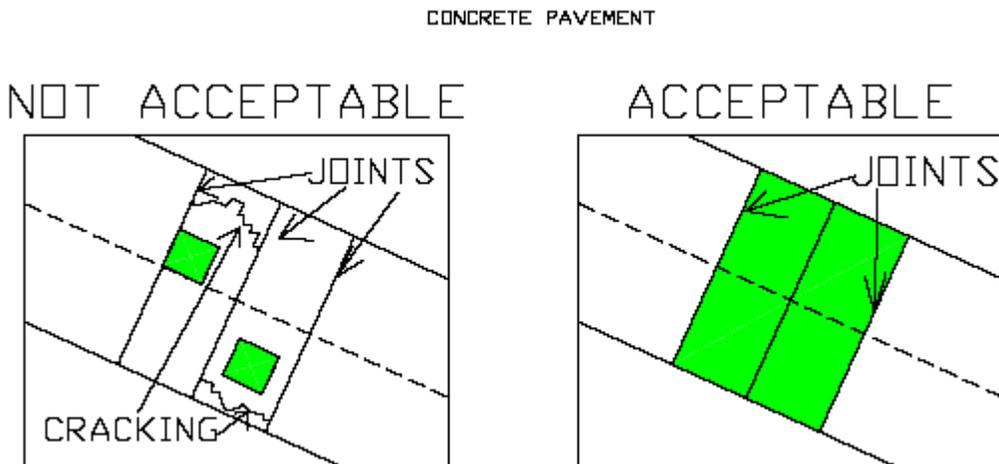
Example 4: In concrete pavements, remove sections to existing joints.
